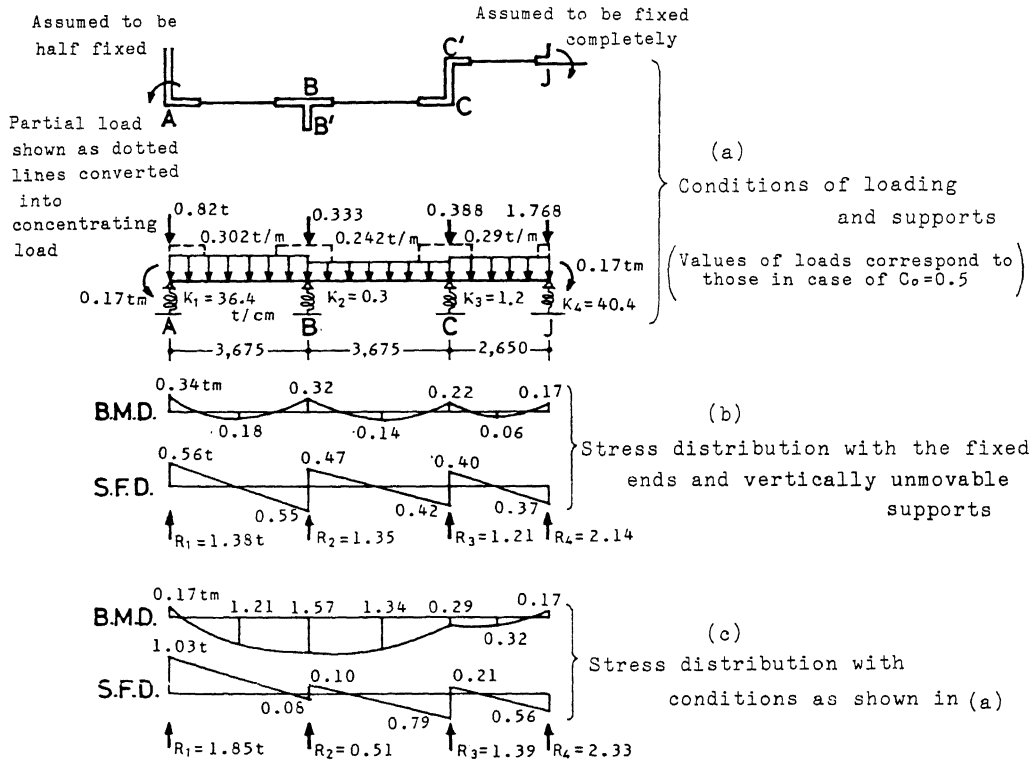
Stress distributions of south wall collar beam on the assumptions that it is a idealized continuous beam with and without spring supports (in case of $C_0=0.5$)
